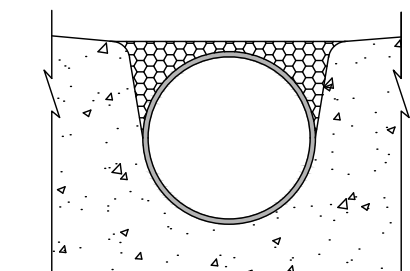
H: PLACE FORMWORK AND THEN CONCRETE
